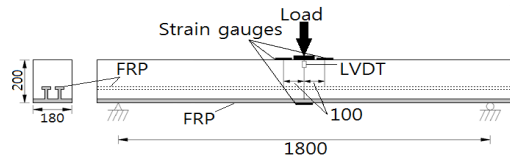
Dimension and typical instrumentation of specimens (mm)
